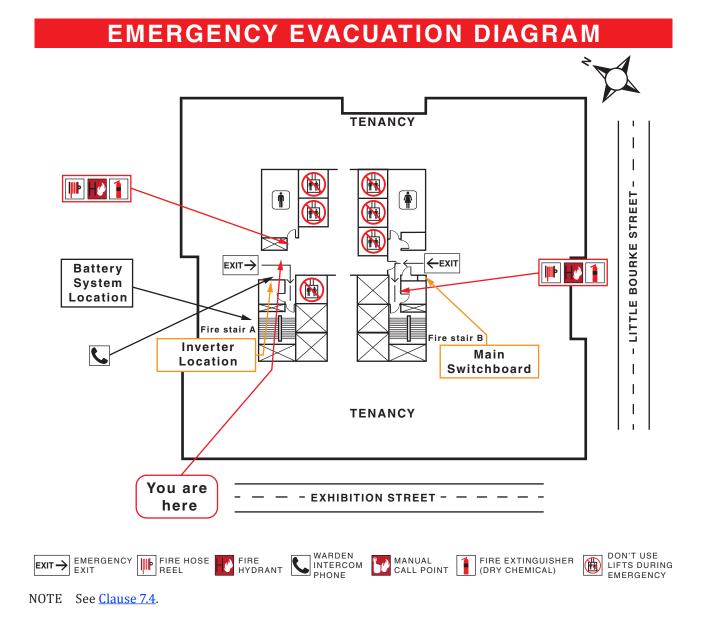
Typical sign for battery system location to be placed at the main switchboard and/or fire/panel
